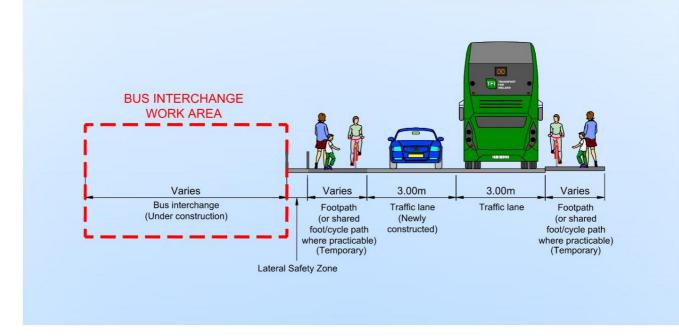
Traffic Management Cross Section, Section 1g – Stage 2
